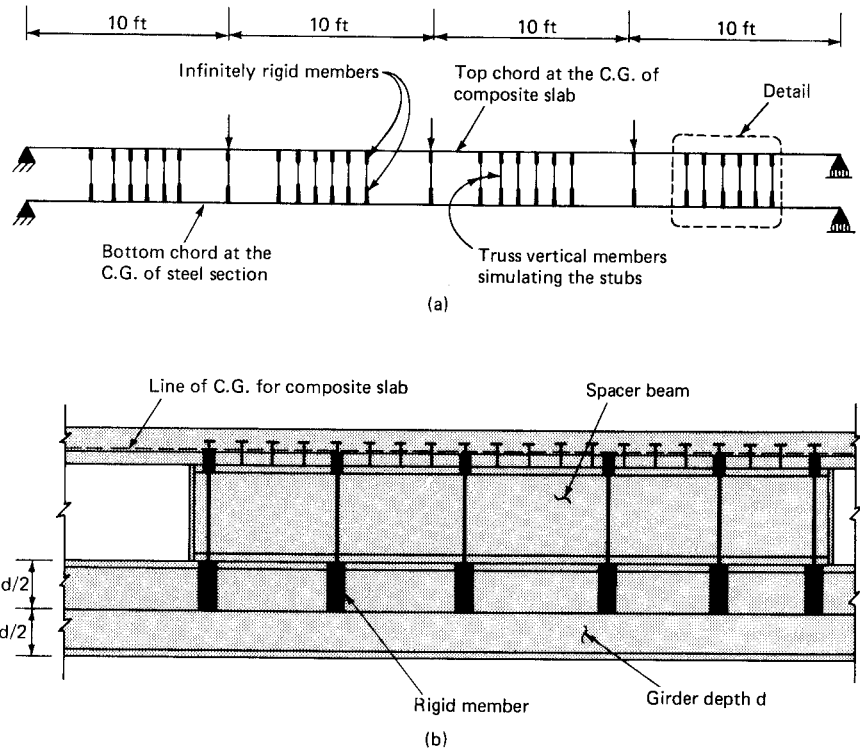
(a) Elevation of Vierendeel truss analytical model; (b) partial detail of analytical model superimposed on stub girder.
